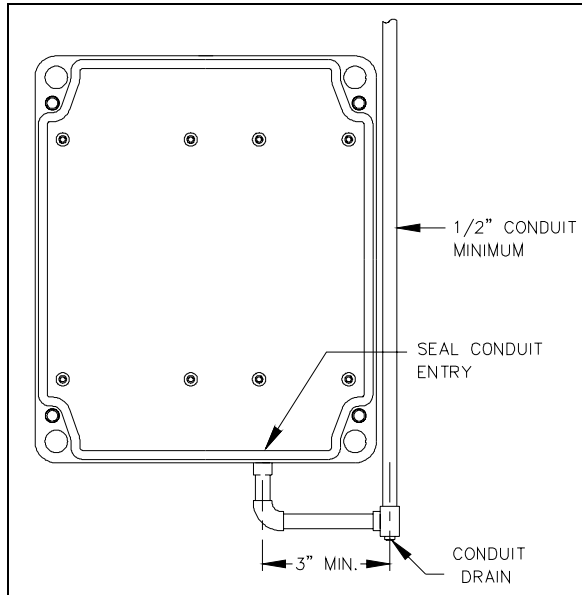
Bottom entry conduit recommended for non-metallic enclosures
